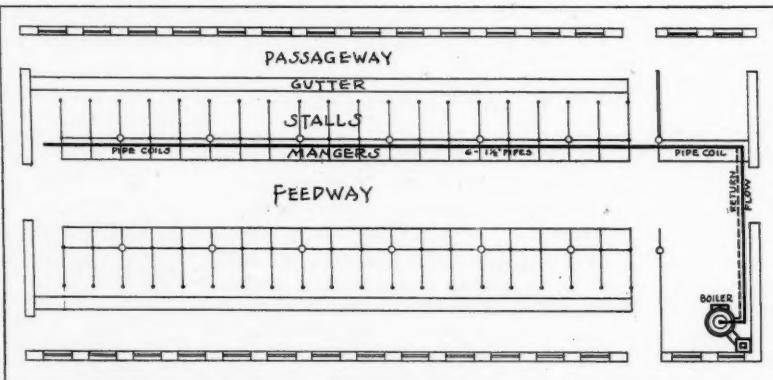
Plan view of a steam heating system in a typical dairy barn, worked out in accordance with principles laid down in the paper
